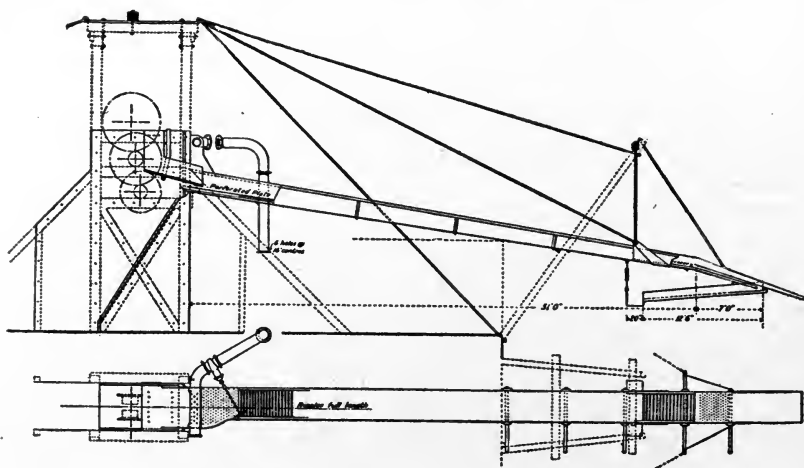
Plan and Elevation of a Long Sluice-box.
